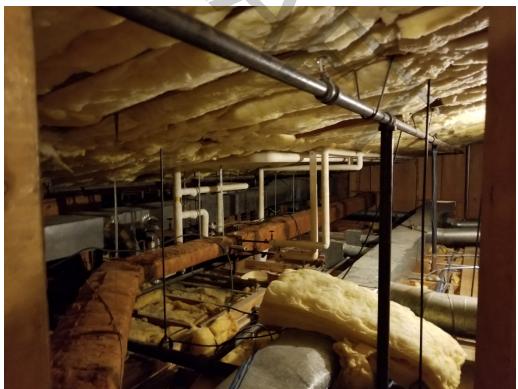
Presumed ACM TSI in the attic under the roof of the original building. (May 22, 2018)
